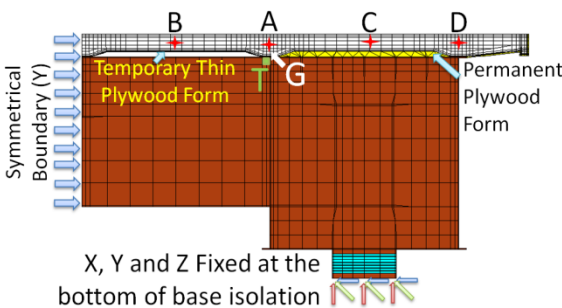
(a) Locations of measurement in Shinkesen Ohashi bridge deck
